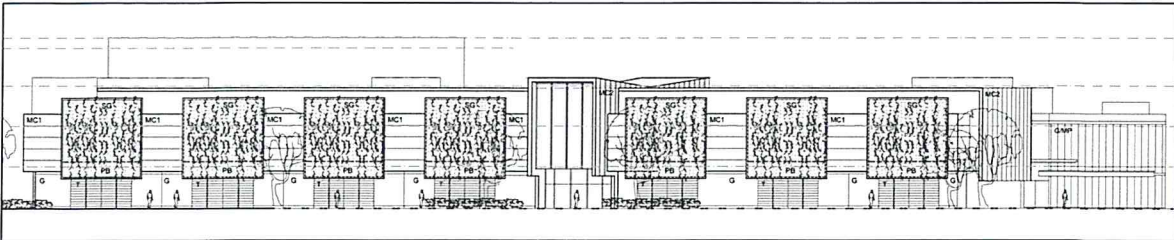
Proposed southern elevation of the hospital (noting unchanged height)
